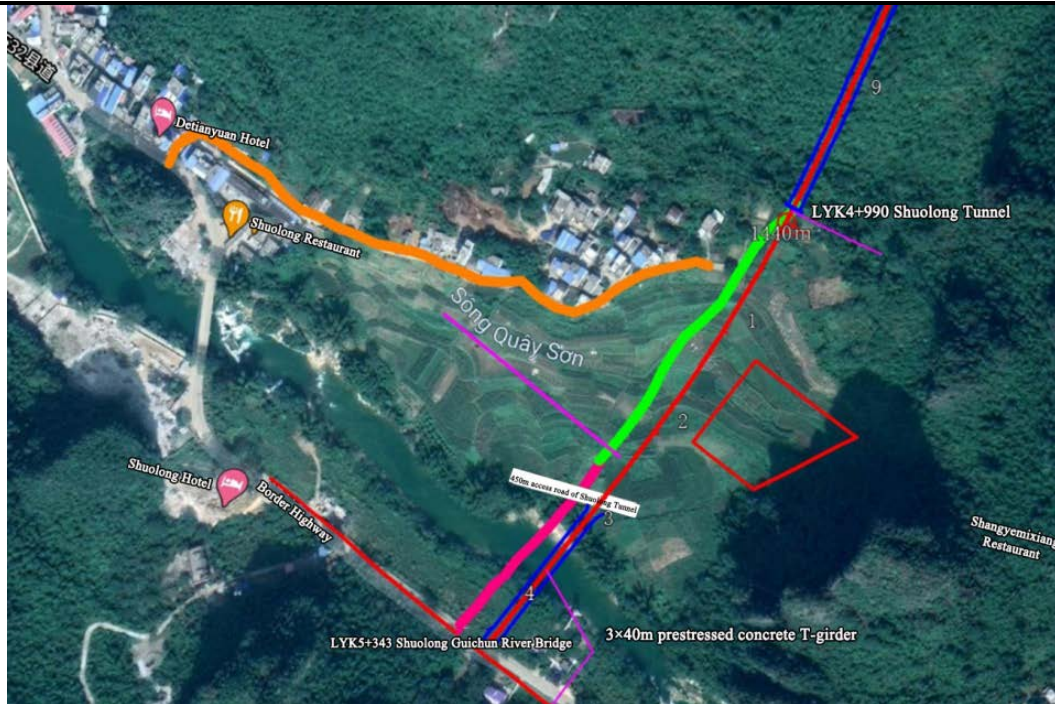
Location of New Access Road at Exit of Shuolong Tunnel and Trestle of Shuolong Guichun River Medium Bridge
